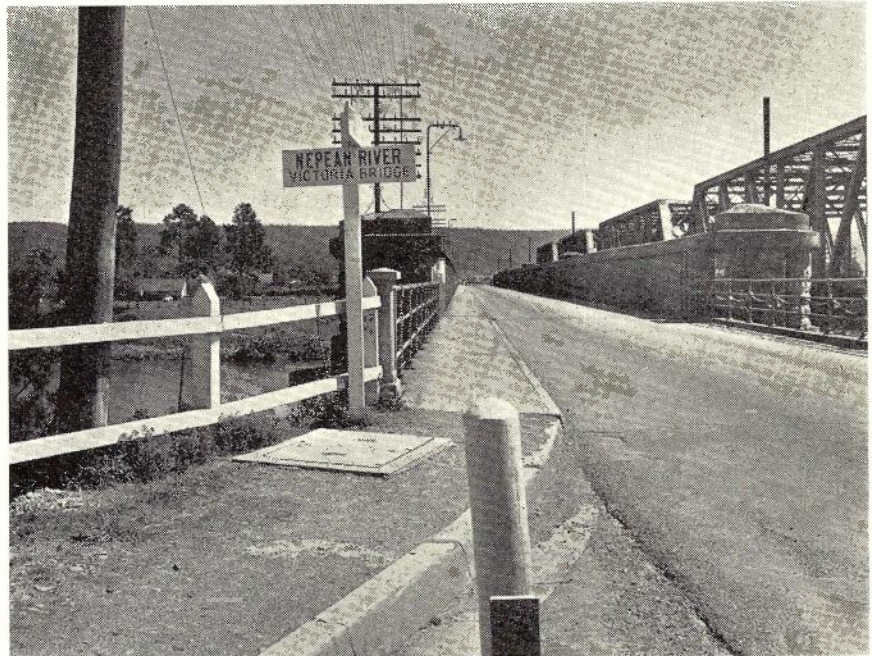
View of Victoria Bridge and adjacent railway bridge.
